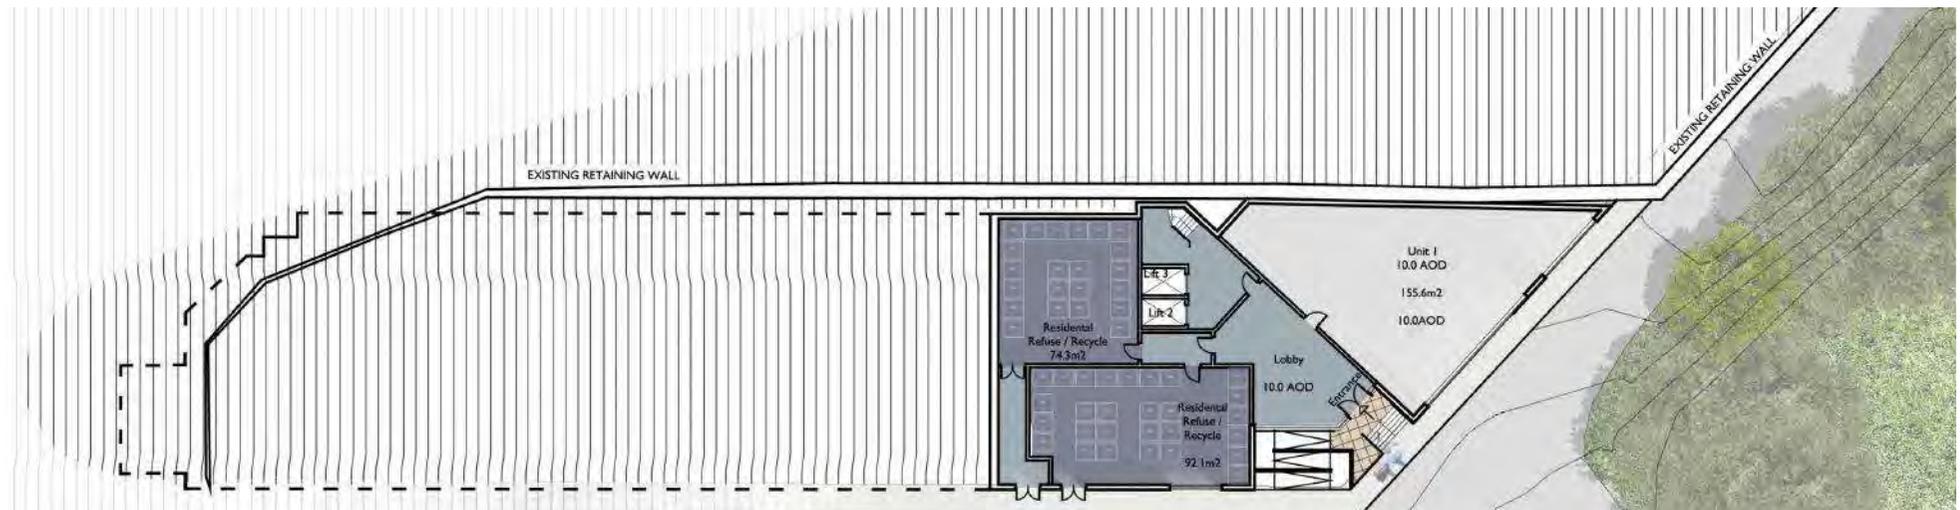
Level -3 plan at 10.0m AOD, with retail, refuse & recycling
